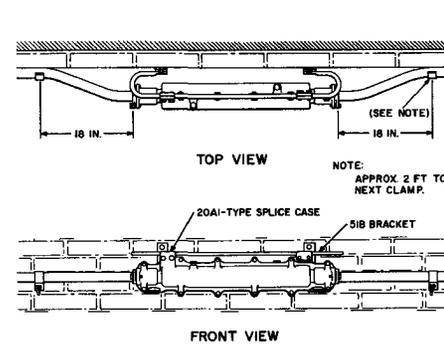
Typical Bracket and 20A1-Type Splice Case Mounting
